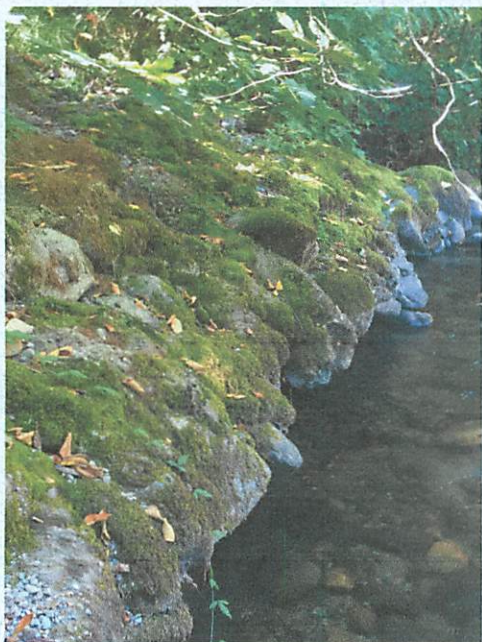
Concrete Covered Boulders Surrounding East Abutment
